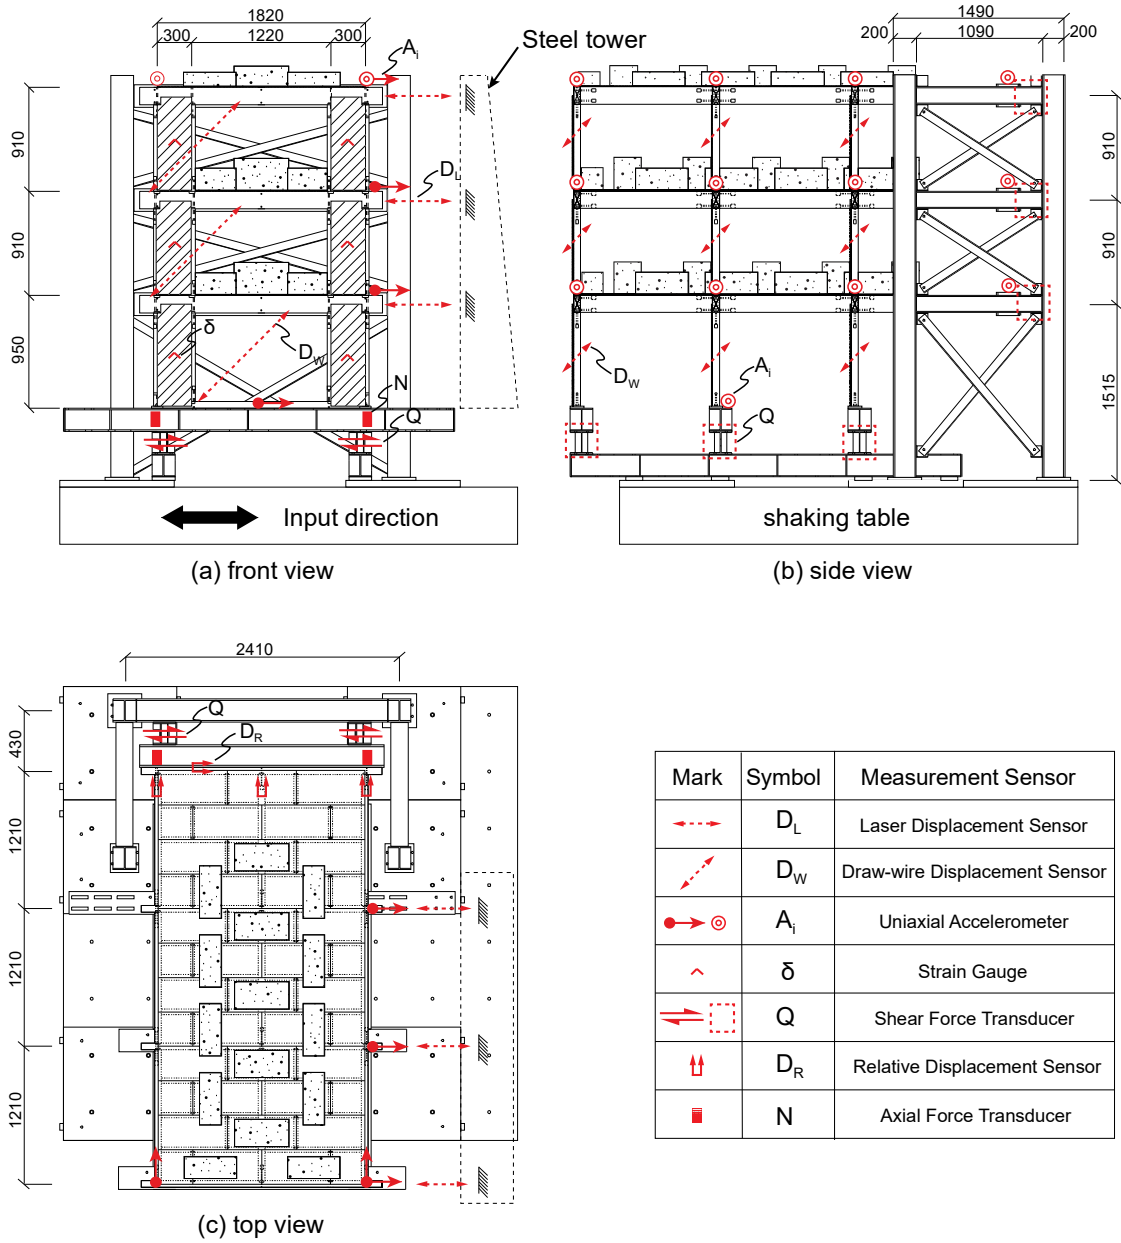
Overall dimension and measurement setup of S1 (in mm)
